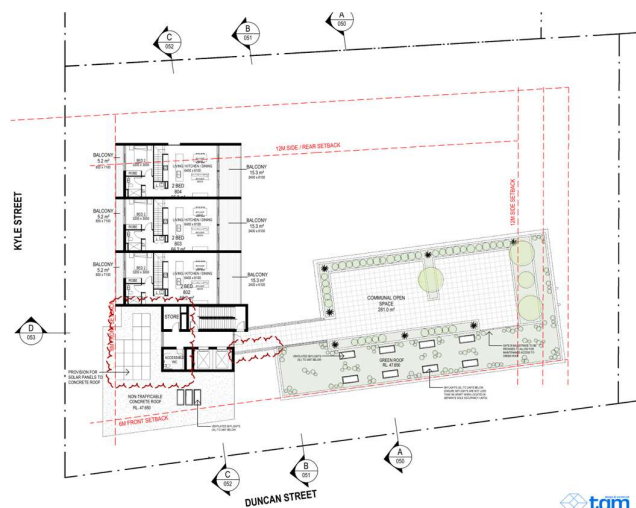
Level 9 / roof top terrace plan of the proposed residential flat development.
